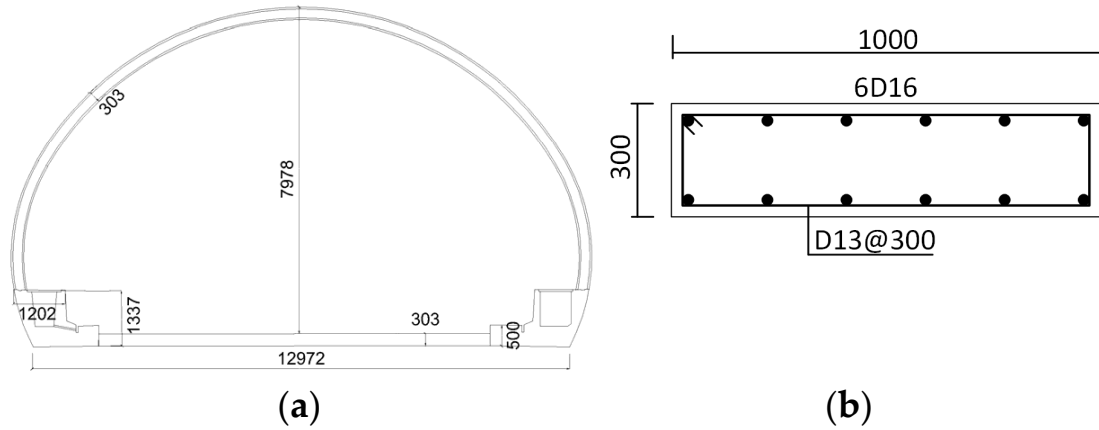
Cross-section and reinforcement of a horseshoe-shaped tunnel (unit mm): (a) Tunnel geometry and (b) reinforcement of tunnel.
